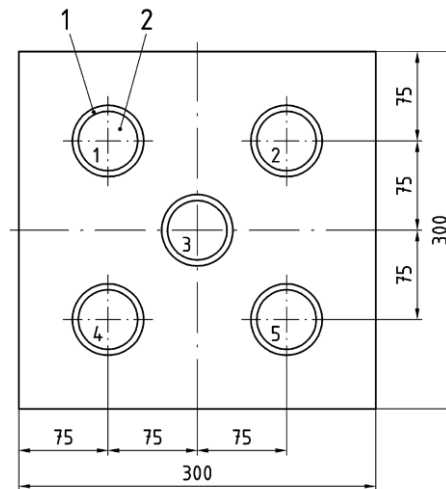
Top view on the test specimen after drilling the concrete cylinders out of the concrete plate according to EN 1542
